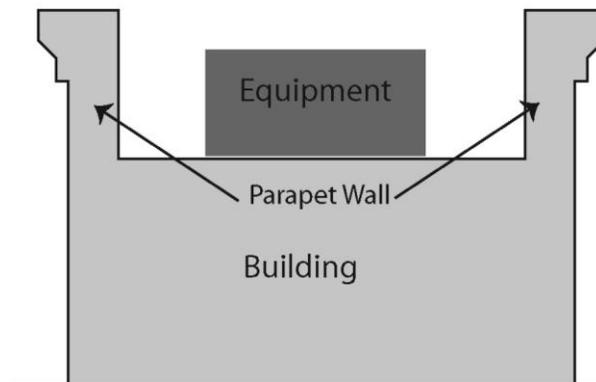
Example of how parapet walls are utilized to screen roof mounted mechanical equipment.
